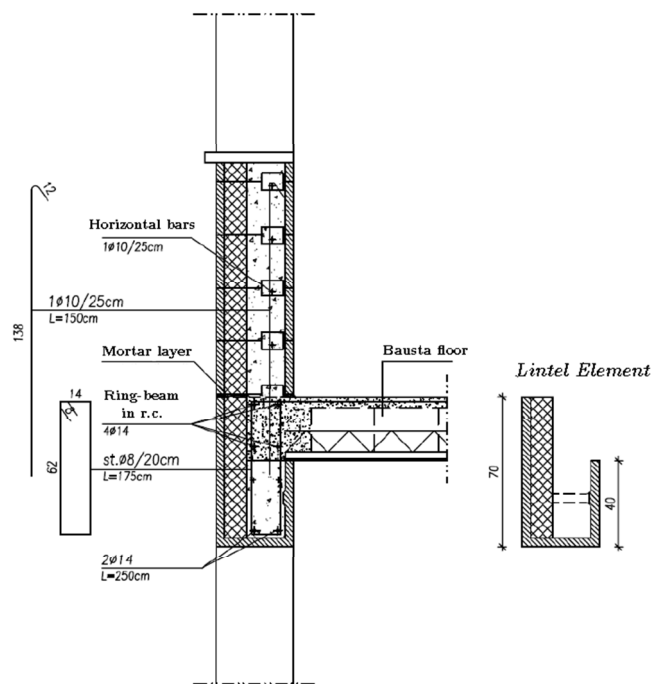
Wall-to-floor joint section (right) and lintel special block (left)
